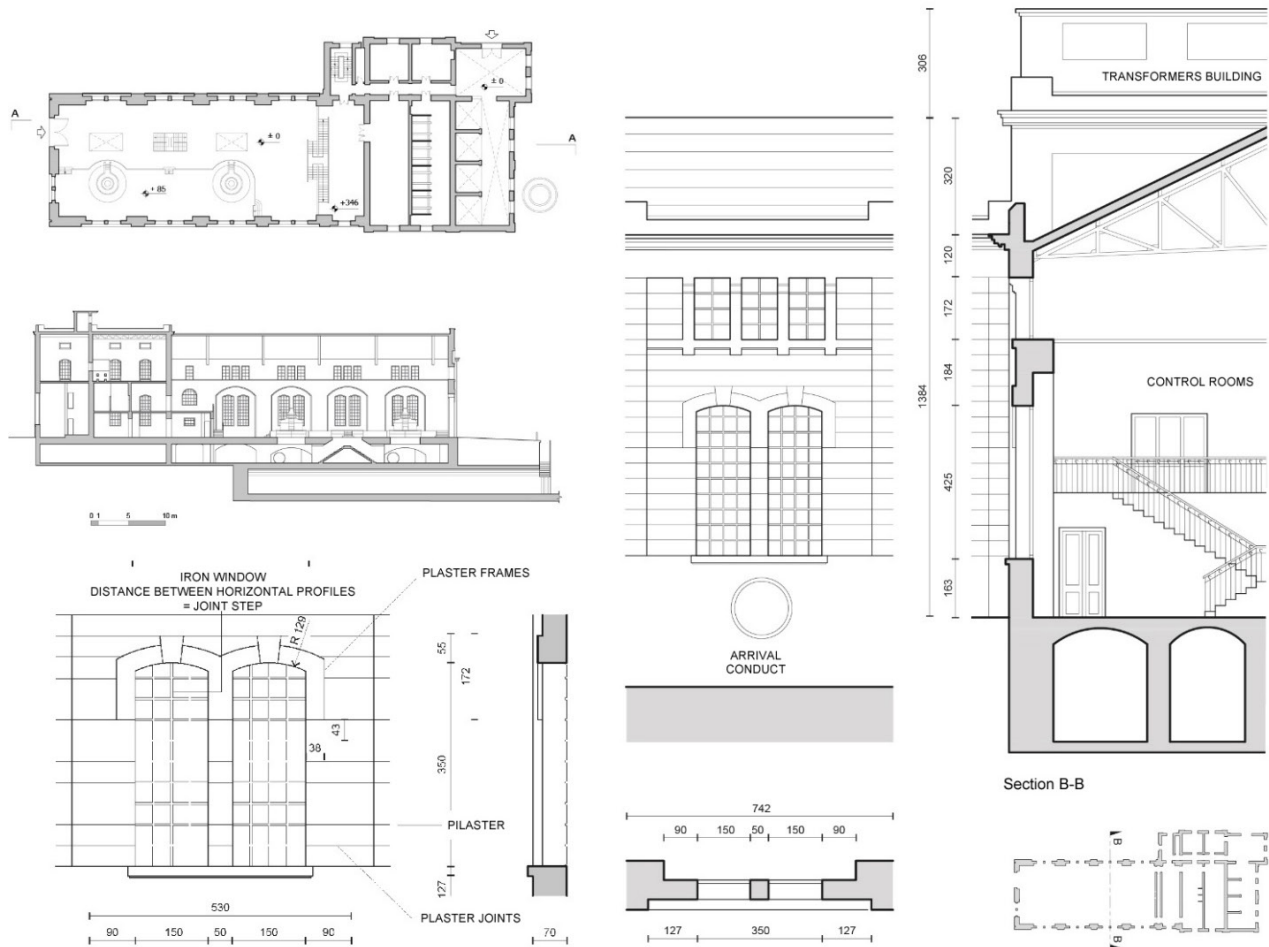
Giais power plant. Left from the bottom: power plant plan, longitudinal section, western elevation windows detail. Right: architectural layout of western windows © F. Chinellato, L. Petriccione.
